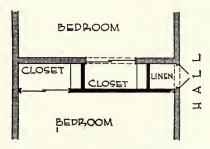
Closet strip between bedrooms. Suitable for new or remodeled house. Minimum closet, 2 feet wide.
